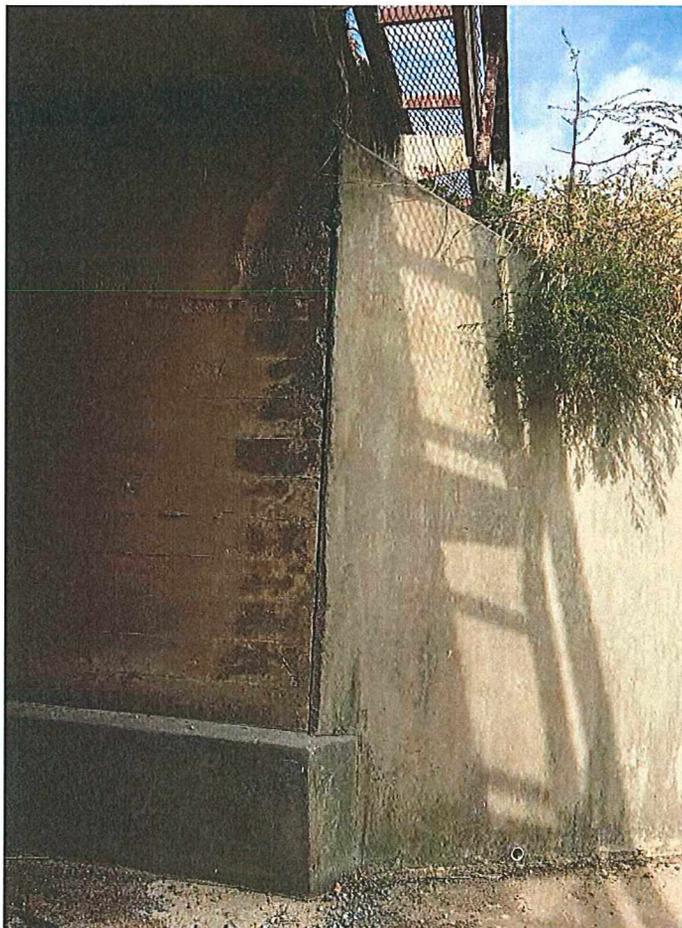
(side photo) is looking at the gap between the north abutment wall and northeast wingwall. The width of the gap opening measured 1.5" at the top and narrowed to 0.25" at the bottom.
